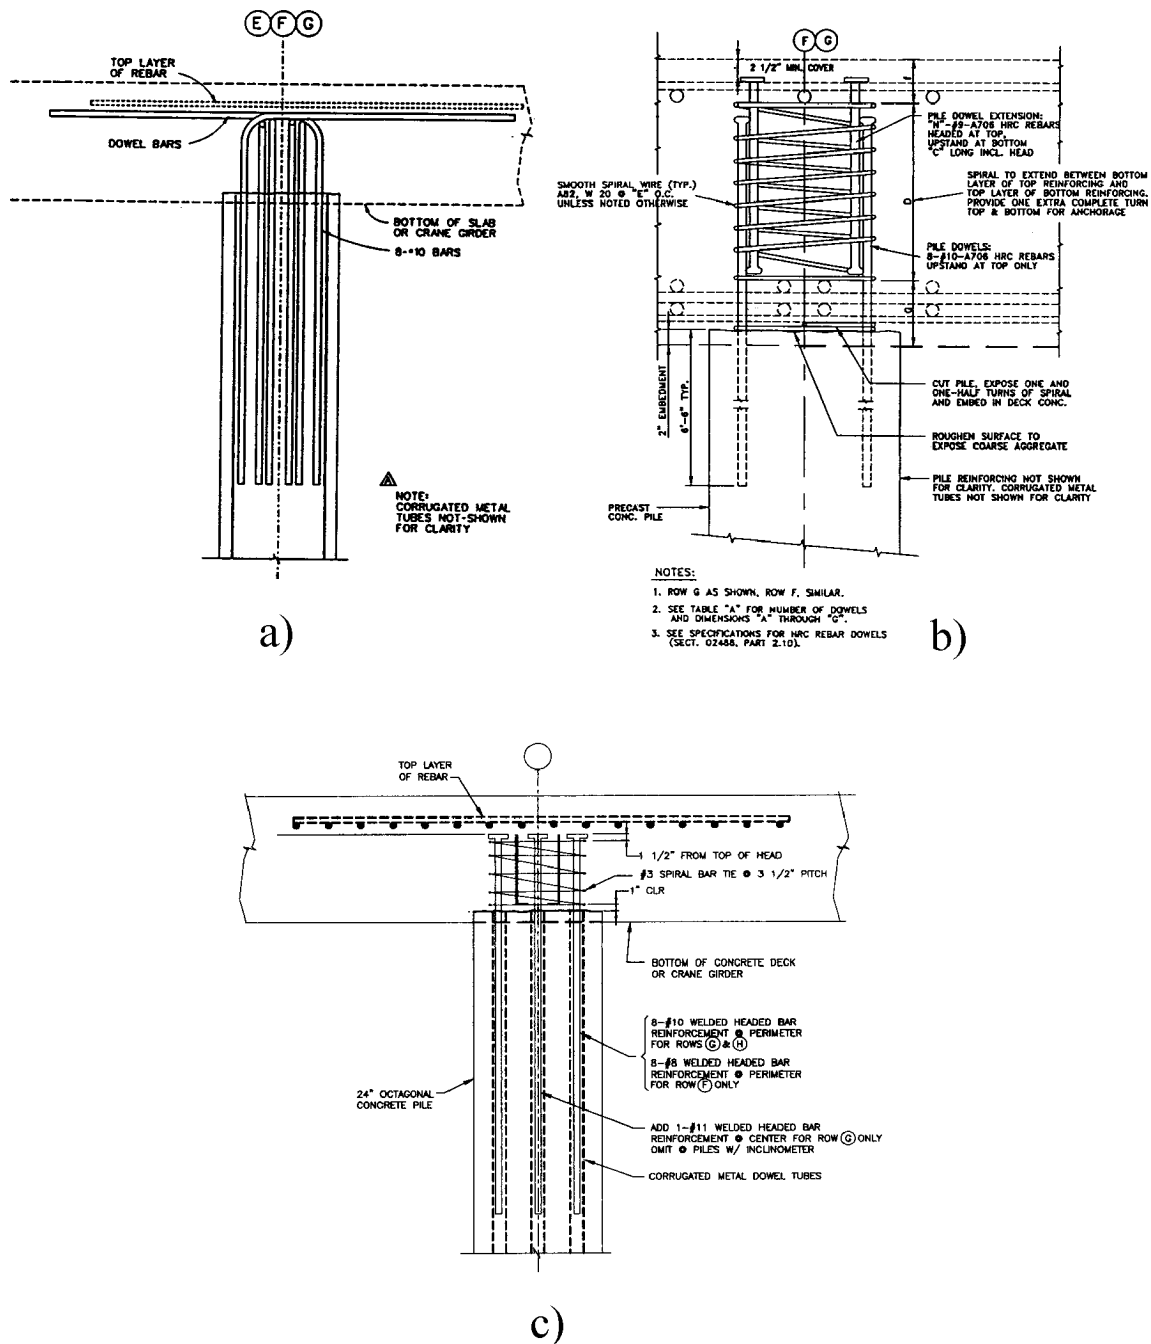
Typical Prestressed Concrete Pile Moment Connections; (a) Inward Bent Dowel Connection; (b) Bond Bar Connection; (c) T-Headed Dowel Bar Connections
